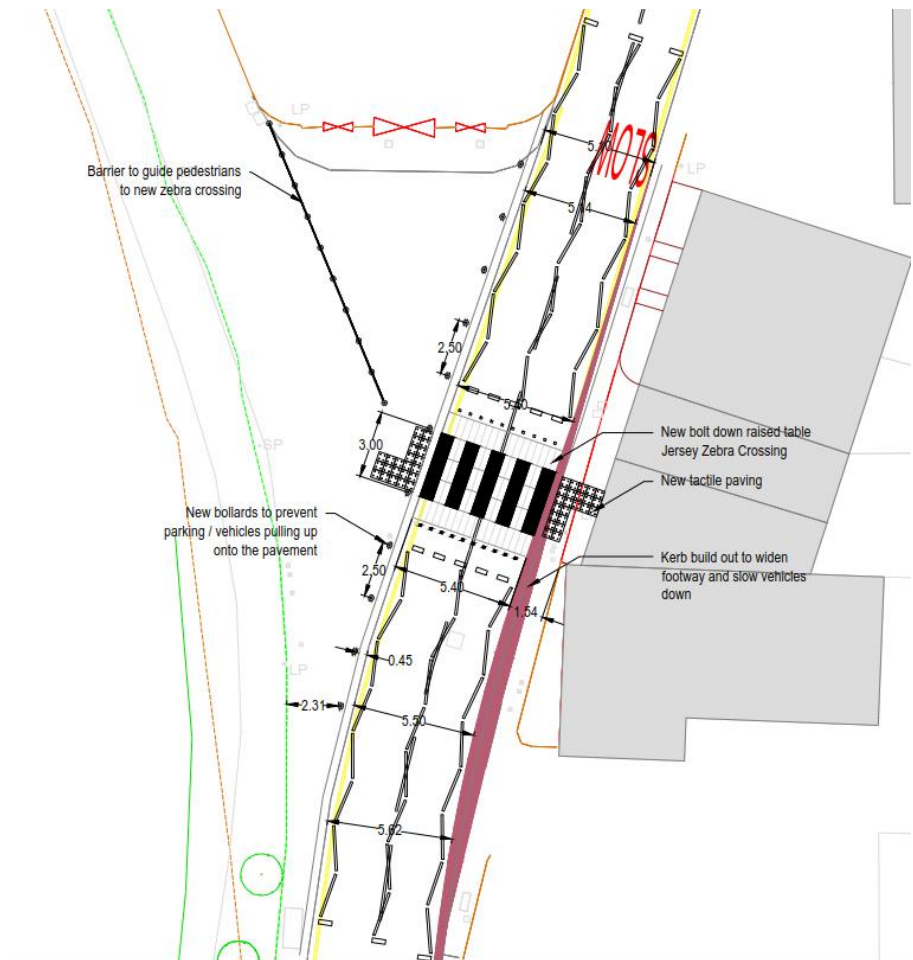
Option 3 Raised Table Jersey Crossing with Kerb Buildout
